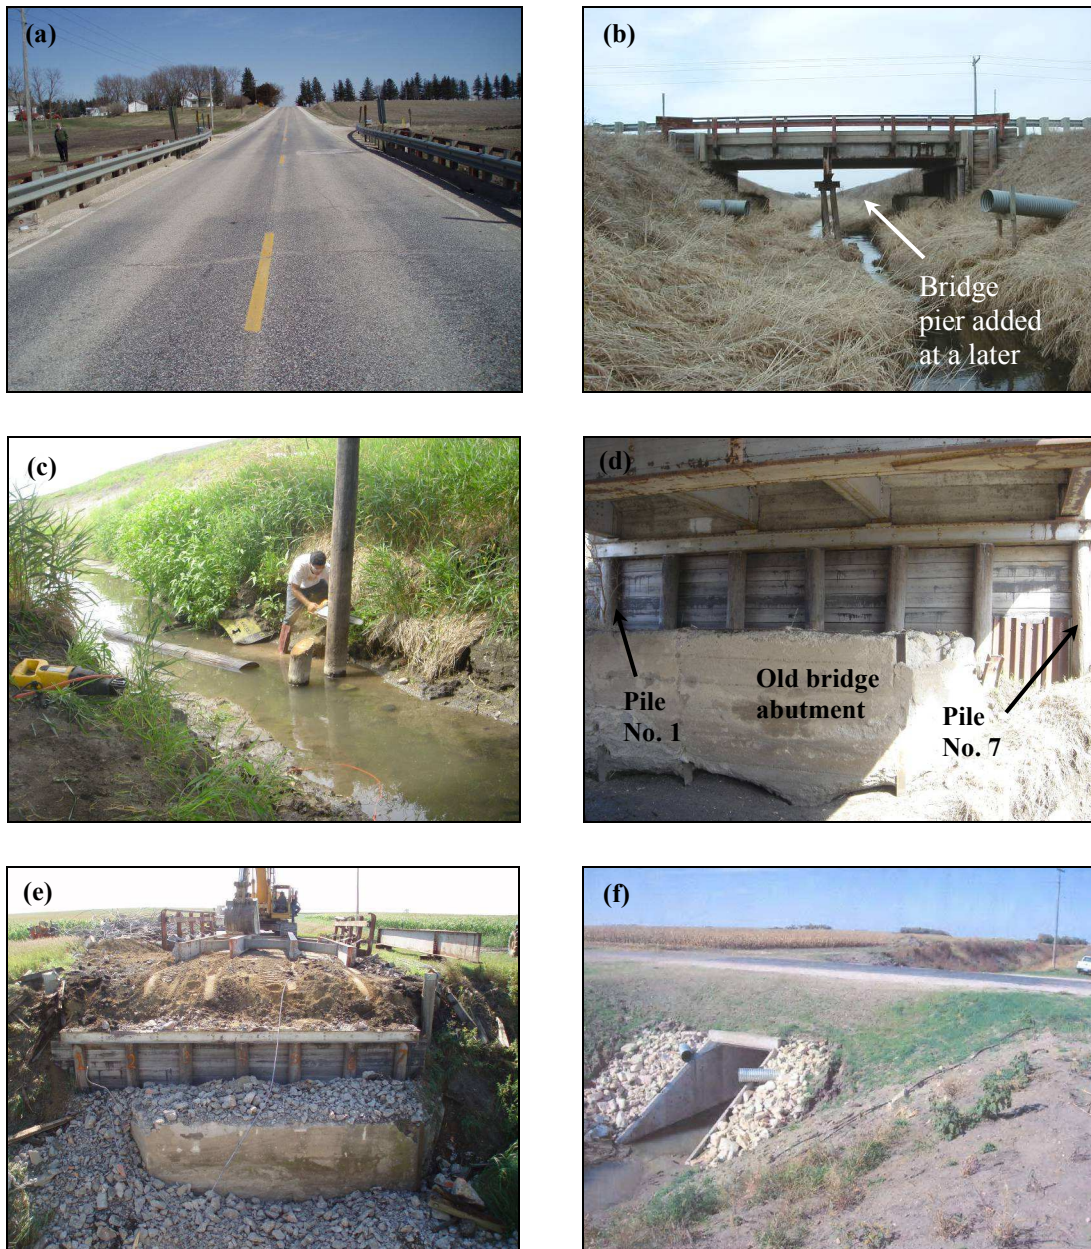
Humboldt County Bride (a) east view of the bridge (b) center pier added in the 1970s (c) cutting the timber piles supporting the bridge pier (d) east abutment (e) removing the bridge superstructure (f) new box culvert
